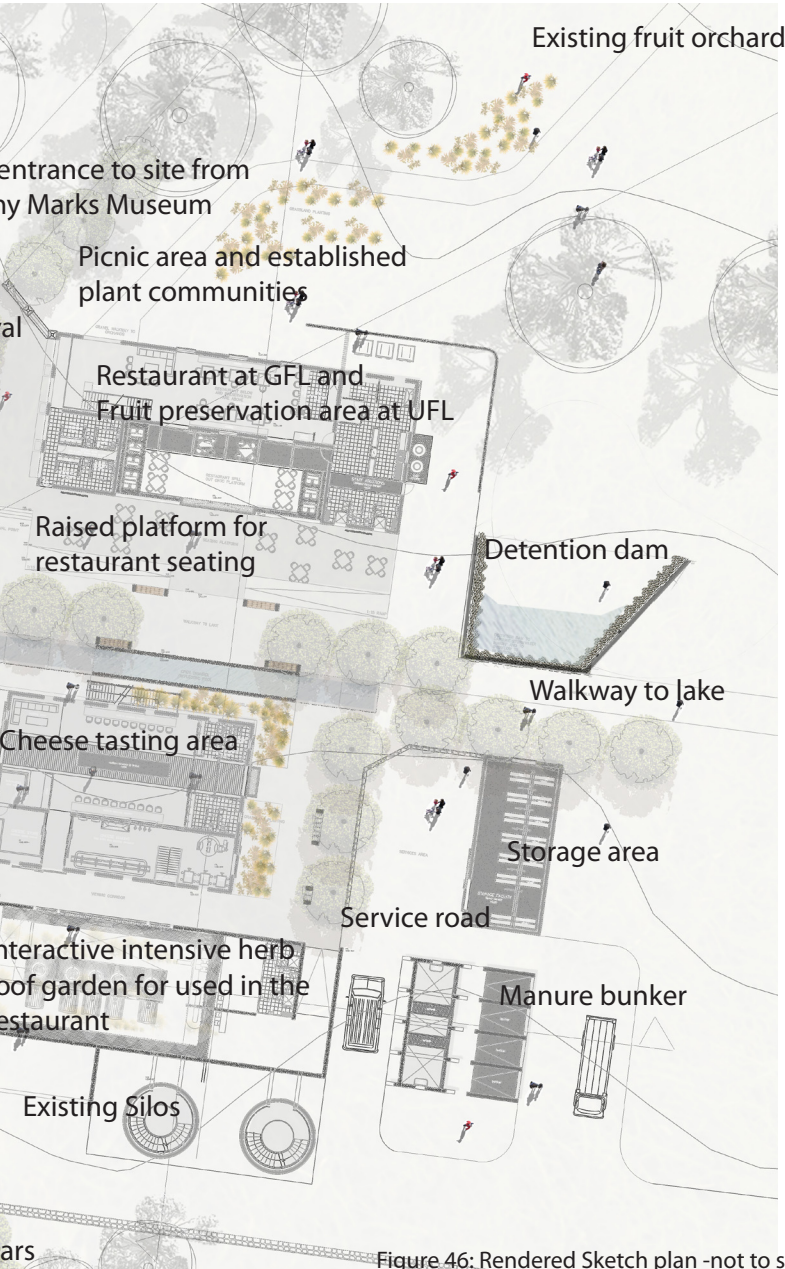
Rendered Sketch plan -not to scale (Author: 2013)
